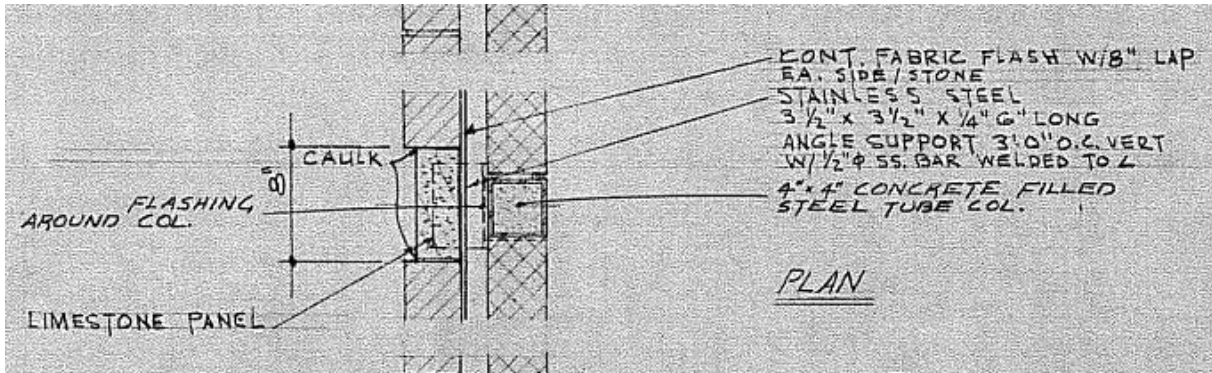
Plan view of chase section Room N. Detail taken from 1/12 of the 1968 Drawings.
